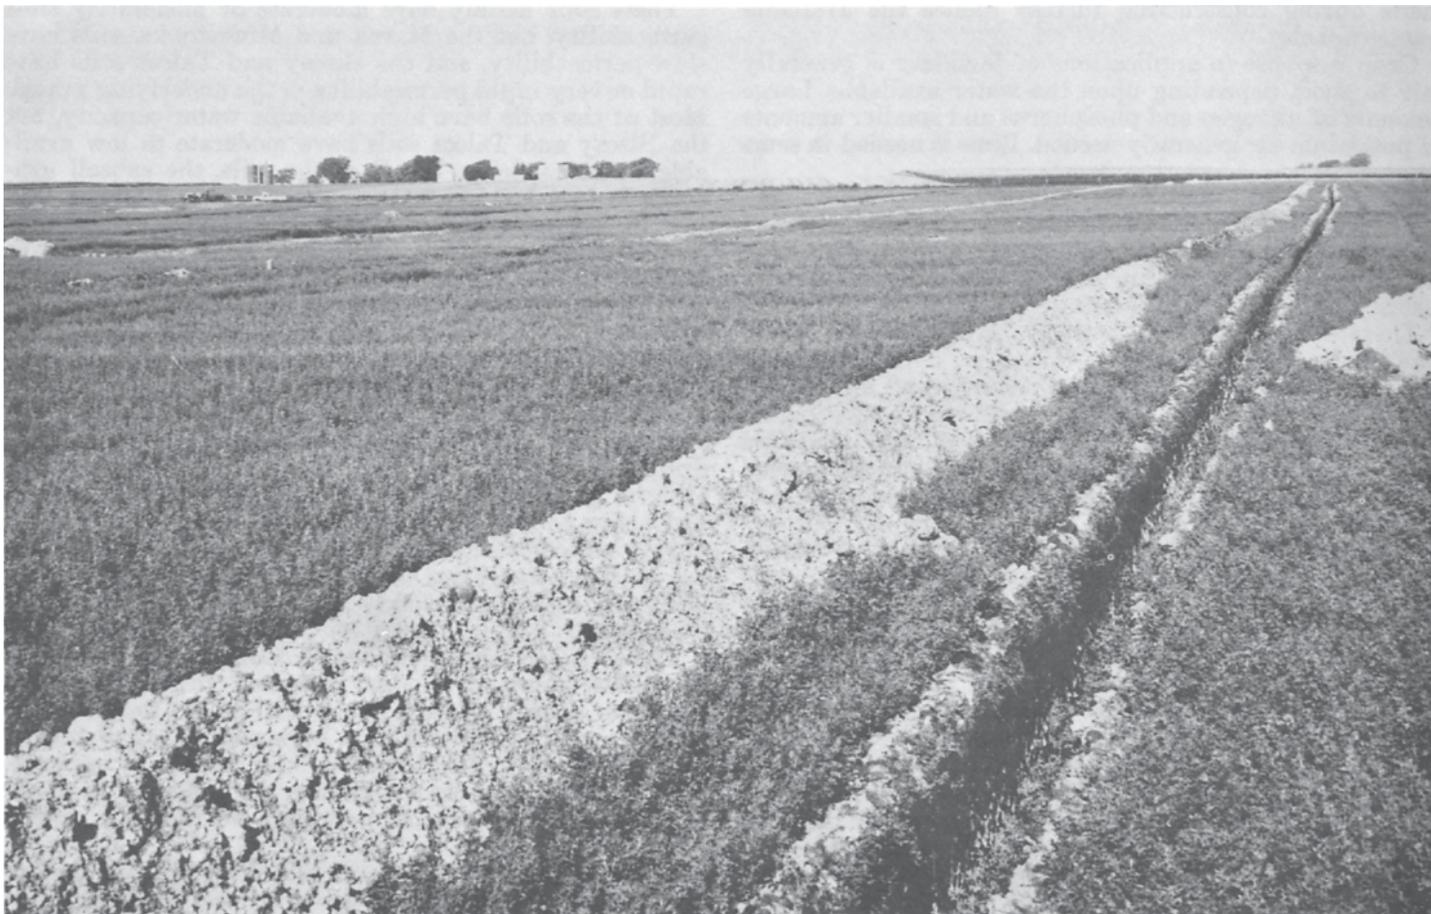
Tile drainage system installed to drain soils of capability unit IIw-1.
